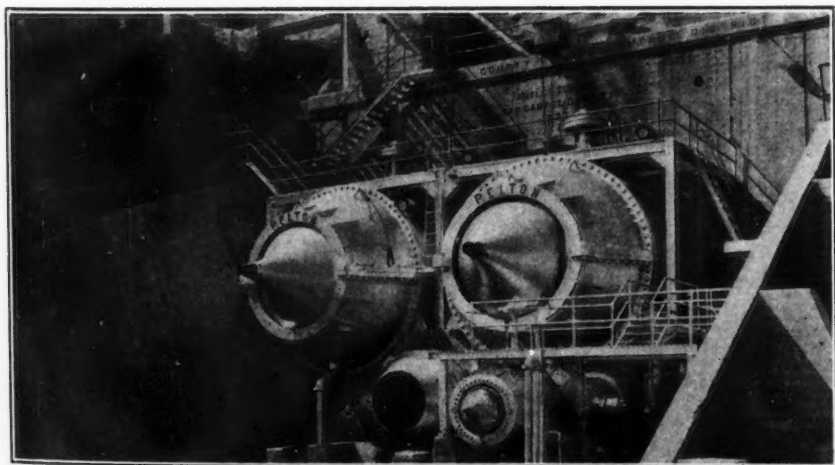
TWO 123-IN., ONE 51-IN., AND ONE 12-IN., NEEDLE VALVES, COMPLETE, SHOWING TEMPORARY NOZZLE ON THE 96-IN. OUTLET
